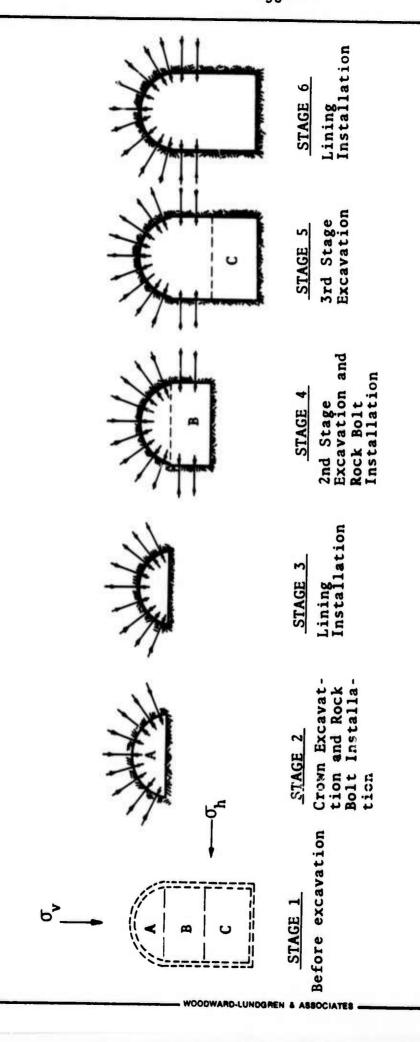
A SCHEMATIC DIAGRAM SHOWING EXCAVATION, CONSTRUCTION SEQUENCES AND GROUND SUPPORT INSTALLATIONS DURING CONSTRUCTION OF AN UNDERGROUND OPENING
